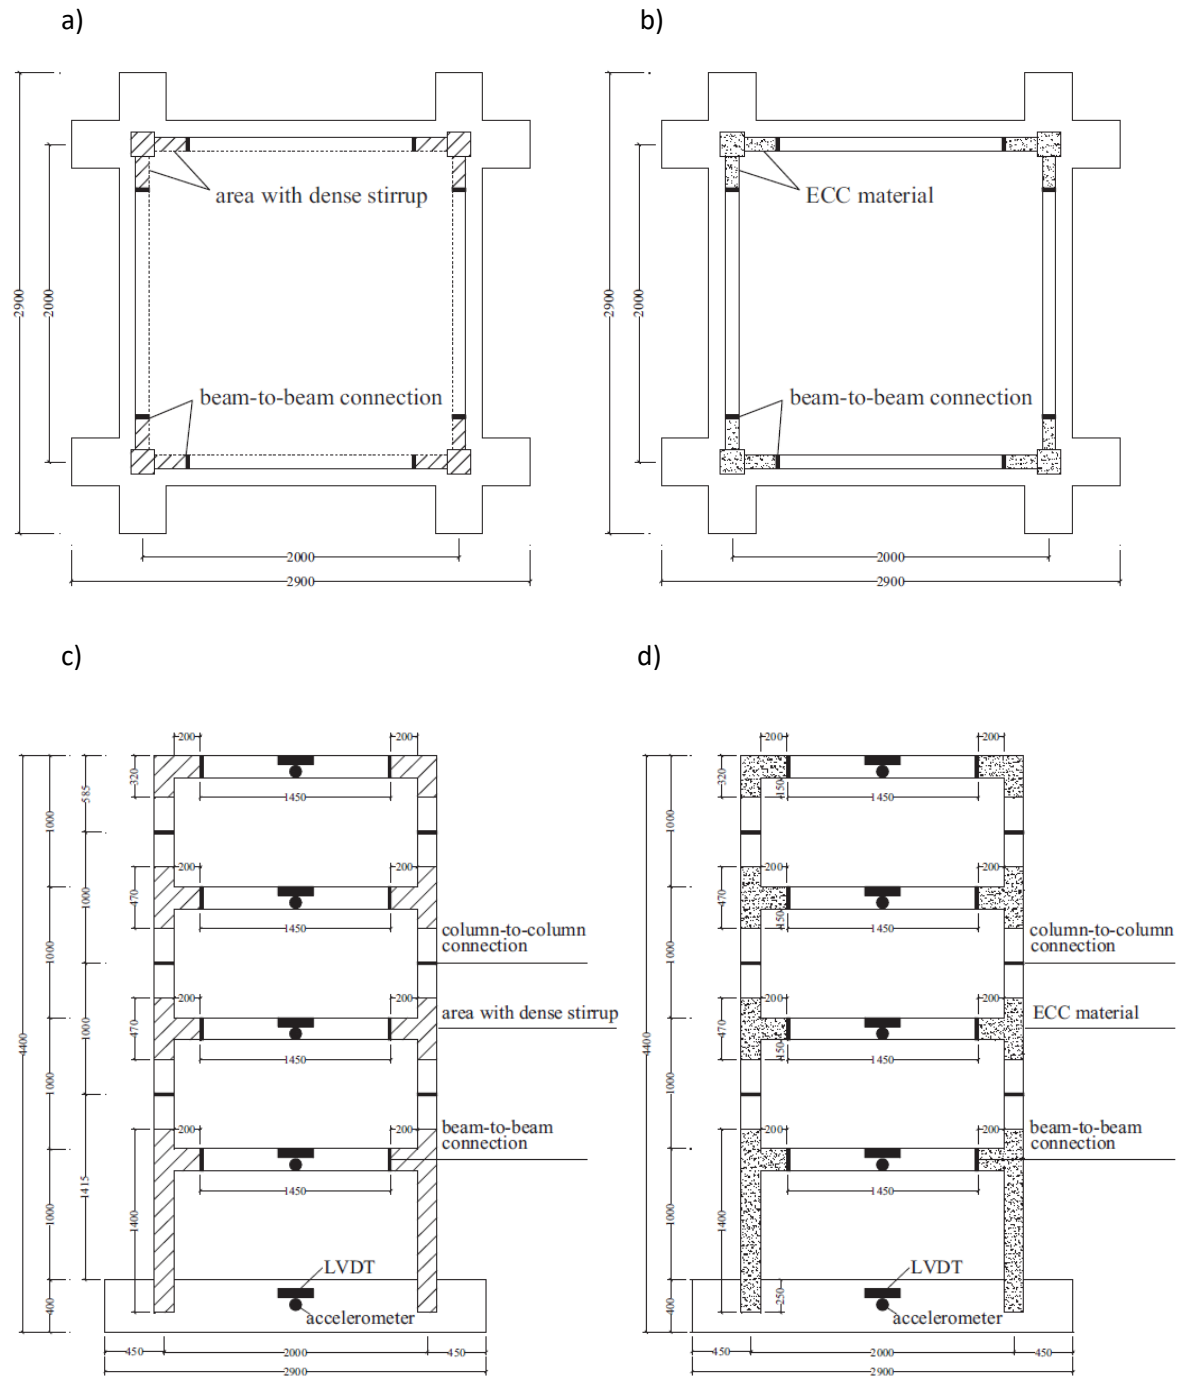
Geometric properties of the testes specimens: a) Floor layout of RC structure, b) Floor layout of ECC/RC structure, c) Cross-section of RC structure, d) Cross-section of ECC/RC structure [Ref.: 040]
